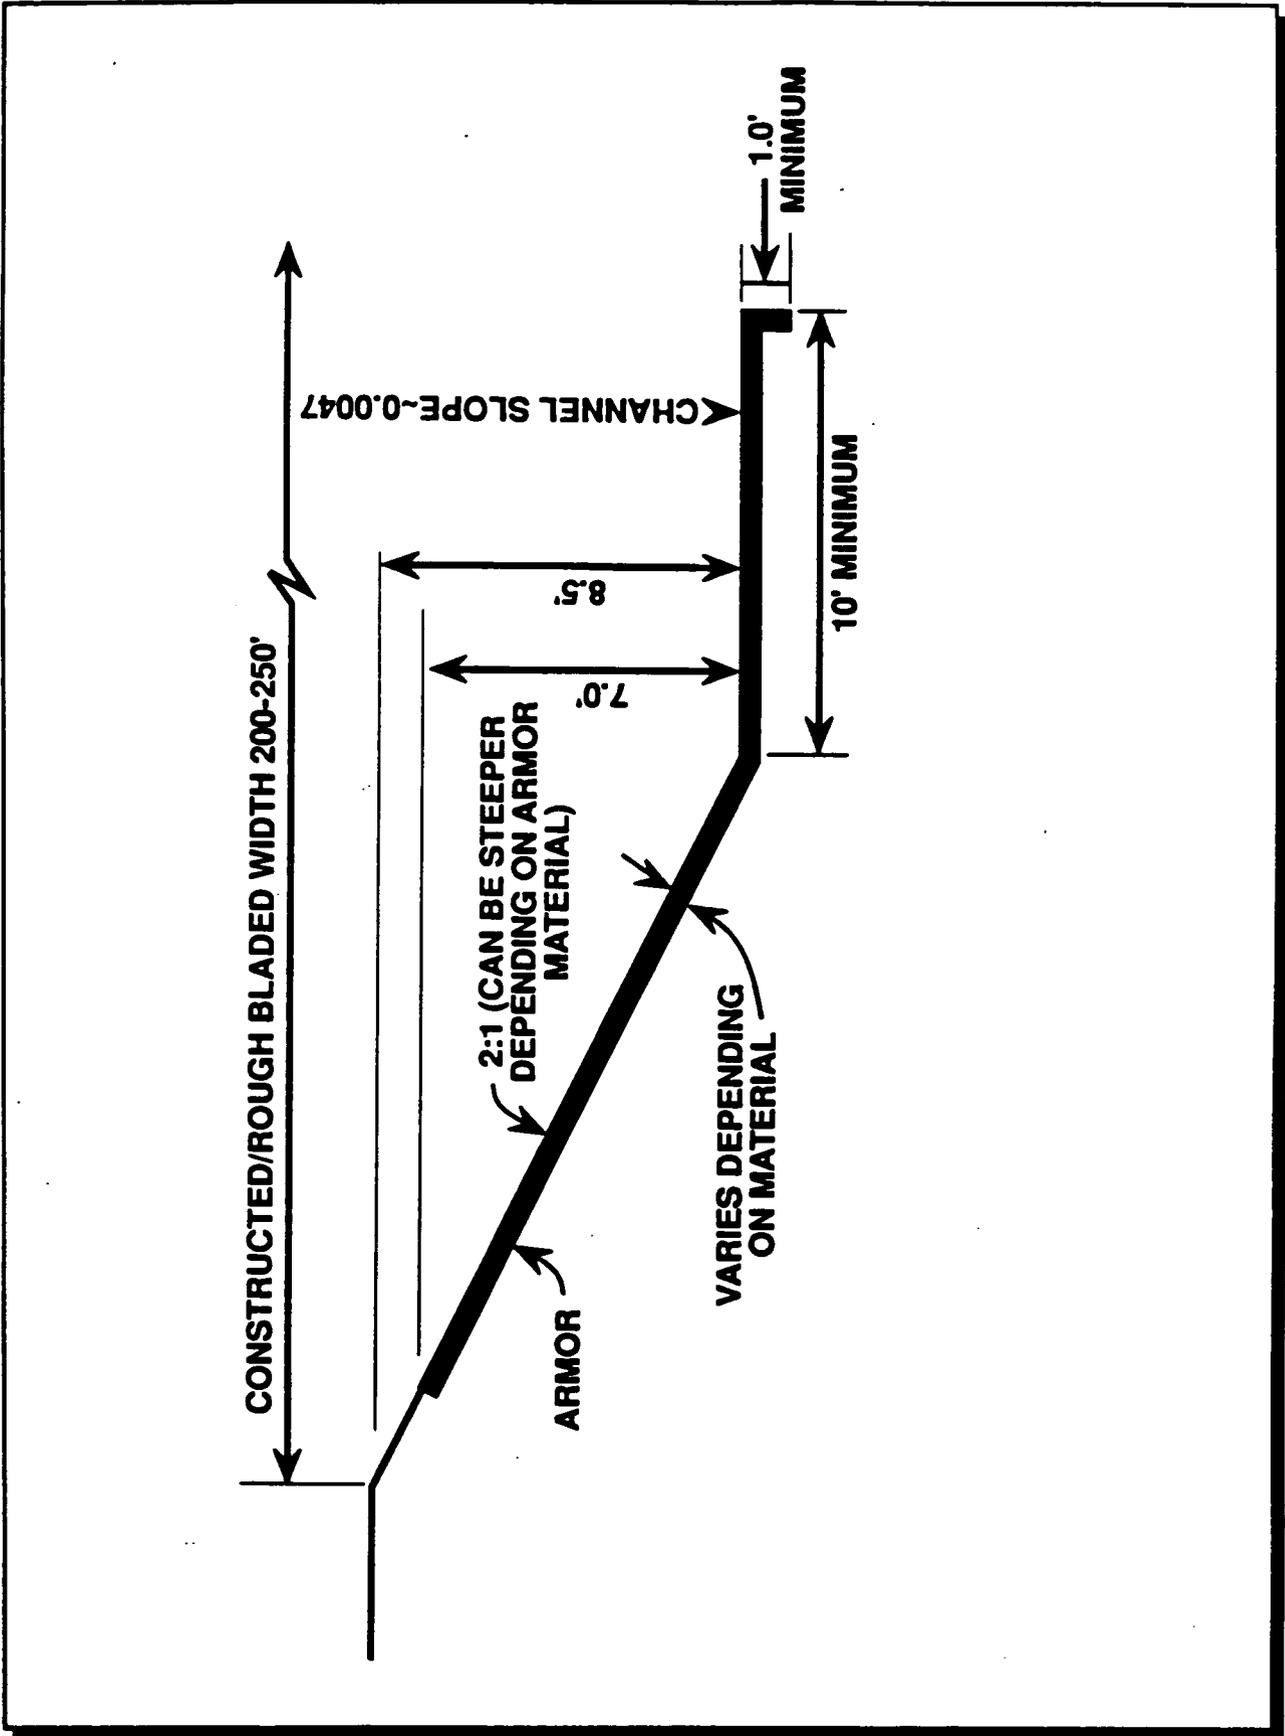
Typical Cross-Section for Northeast and Northwest Flood Protection Dikes and Storm Channels.
